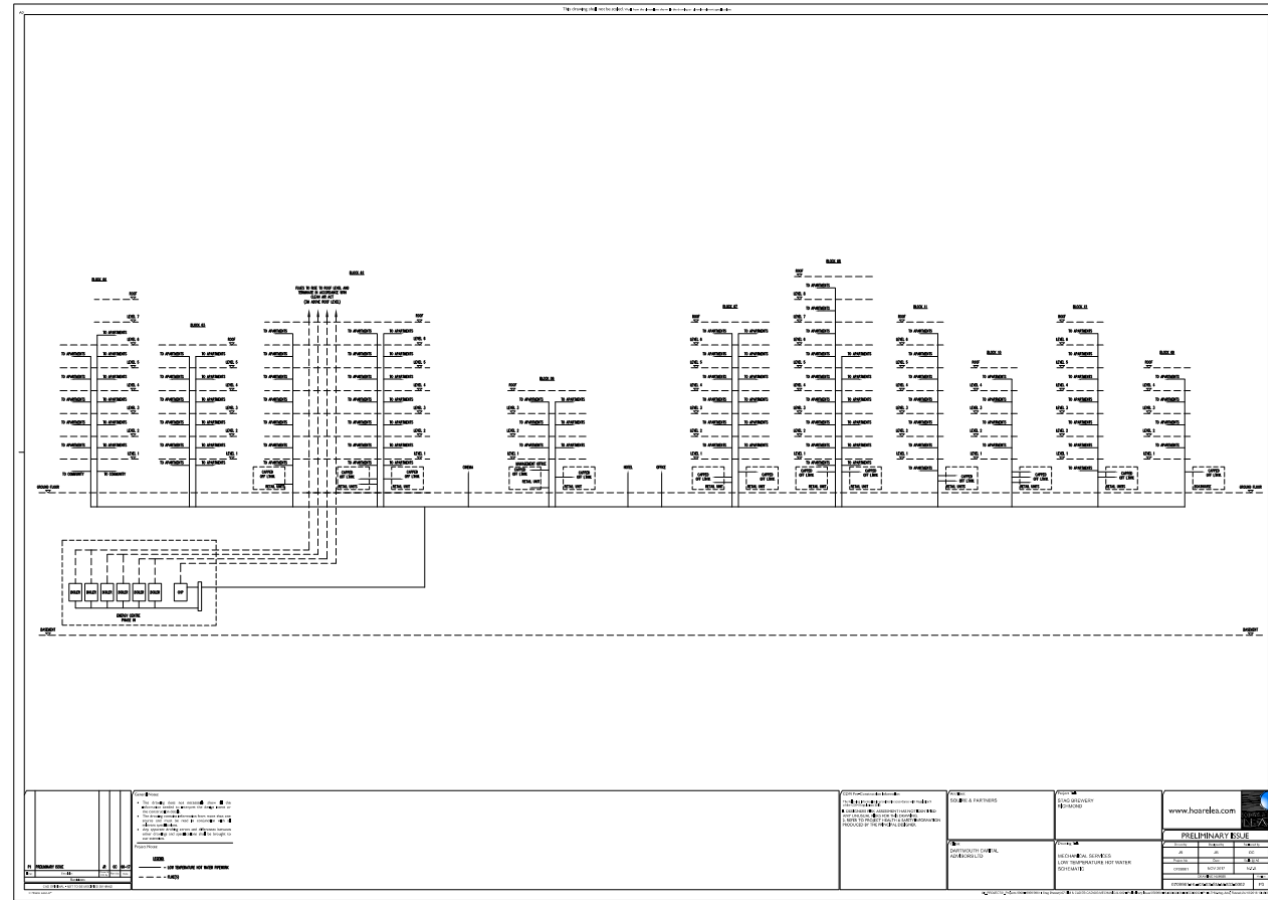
Schematic showing blocks connections to the heat network and an indicative site plan showing connections.
